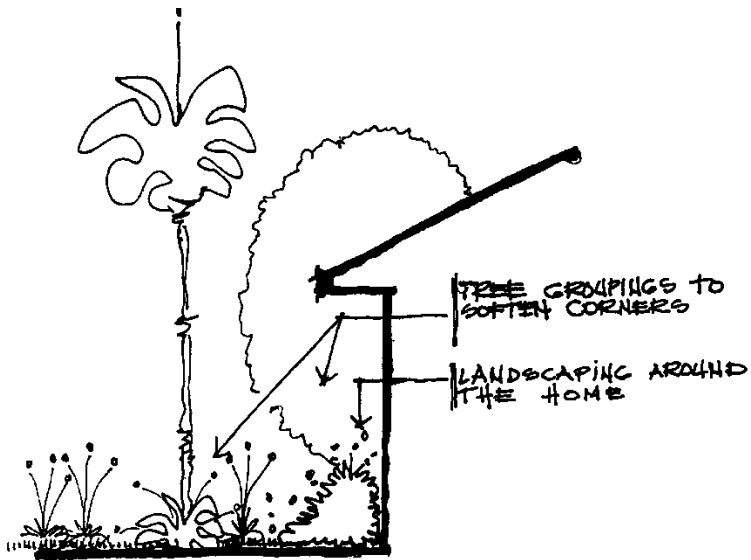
Typical Minimum Landscaping Requirements, Section
